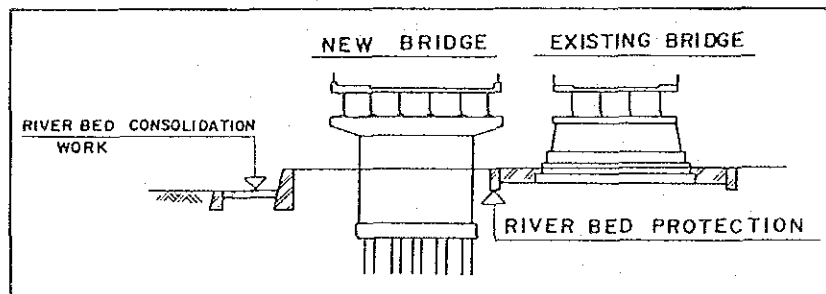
BAGMAT BRIDGE No.2 CROSS-SECTION
